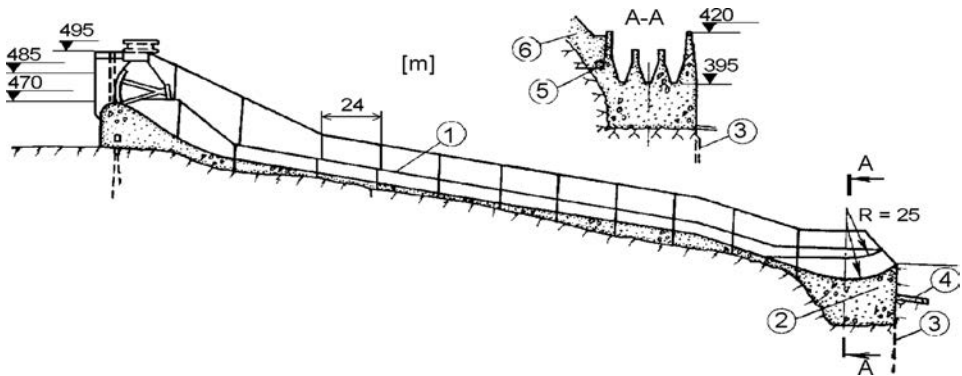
Spillway chute with sidewalls. (1) Upper edge of training walls; (2) terminal structure in the form of a massive block for projecting the water jet; (3) grout curtain; (4) concrete slab with thickness of 1 m; (5) drainage pipe; (6) earthfill.
